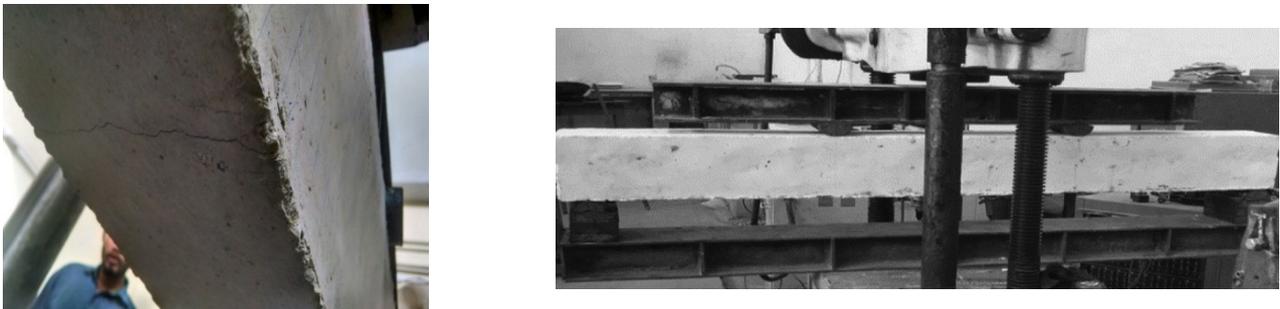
Testing Setup of Beams under Four-point bending Loading and Crack Appearance.
